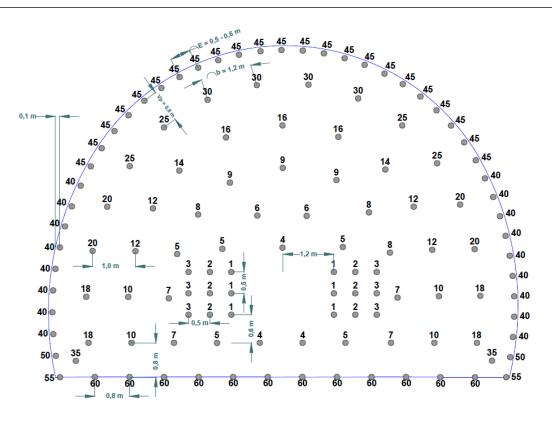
Layout scheme of blast holes on the cross section, as well as the layout of detonators by boreholes, for an advancement step of 3.0 m'
